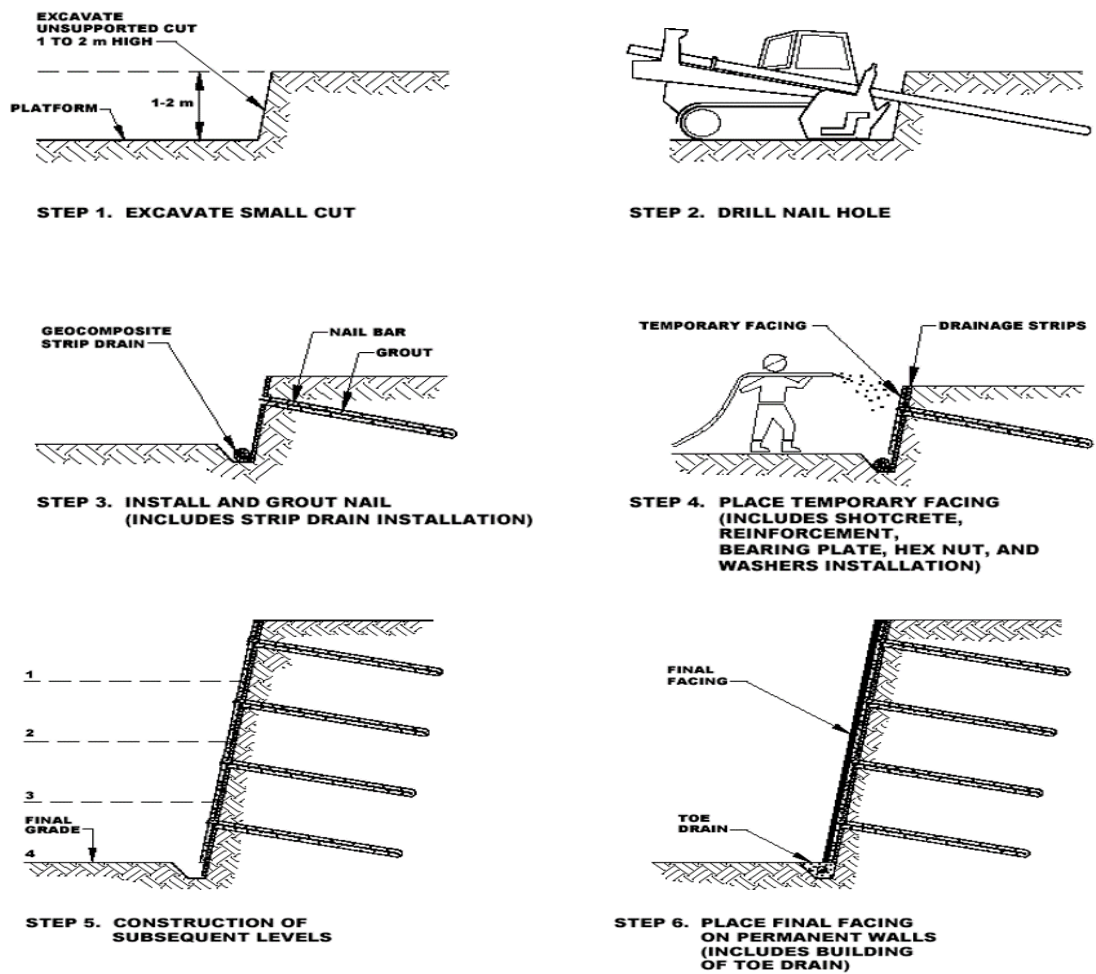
Procedure adopted in the soil nail wall construction in a natural soil slope (FHWA0-IF-03-017)
